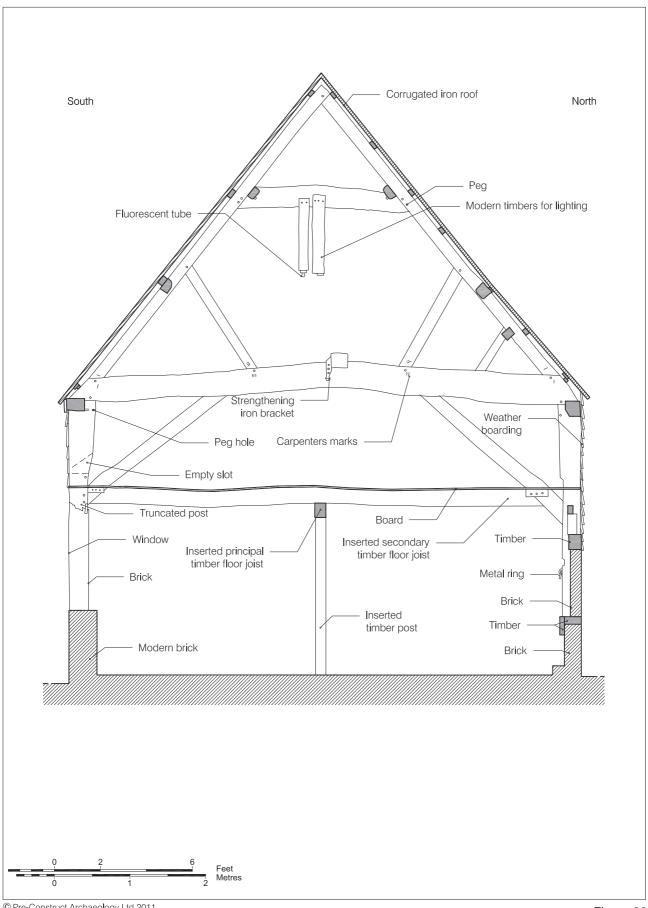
Section A-B through Cottage (Building 4) Looking west Musgrove Maltings Baldock 1:50 at A4
